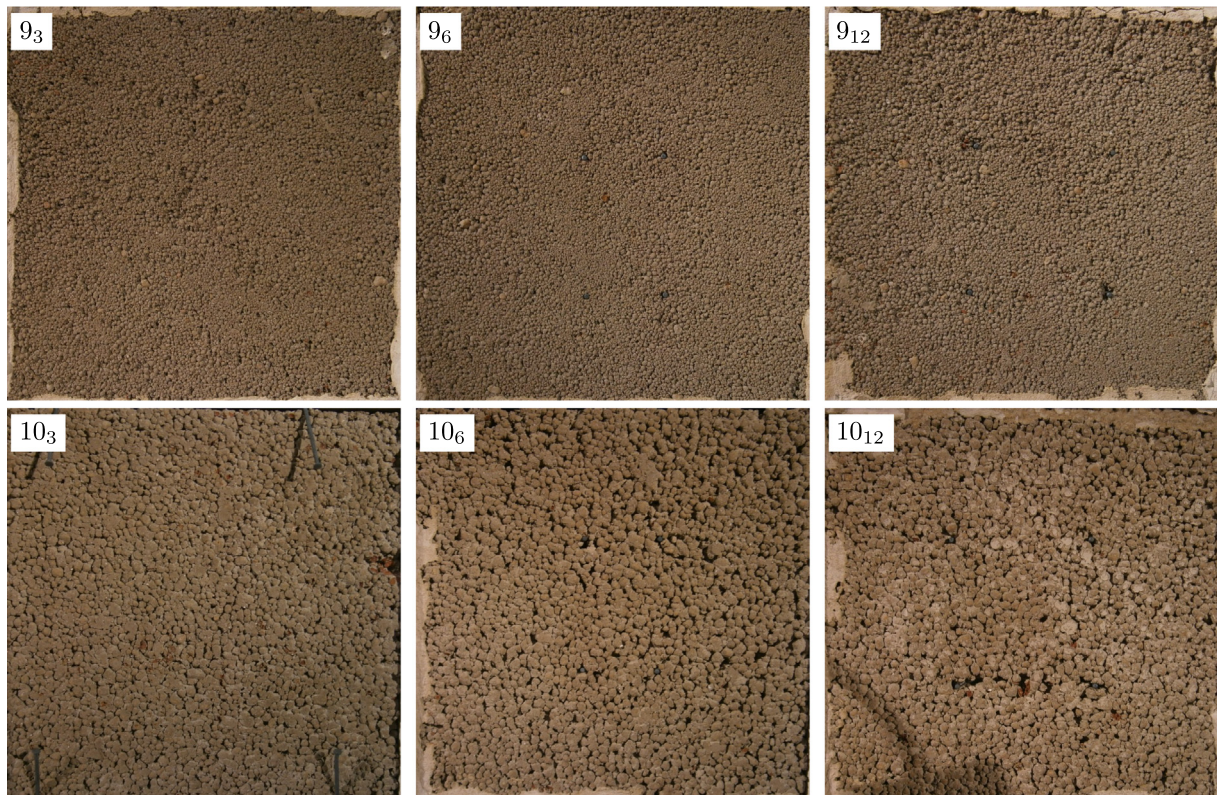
Fire-exposed surfaces of the slab panel specimens made of open-structure LWA concrete (materials 9 and 10), see also [24].
